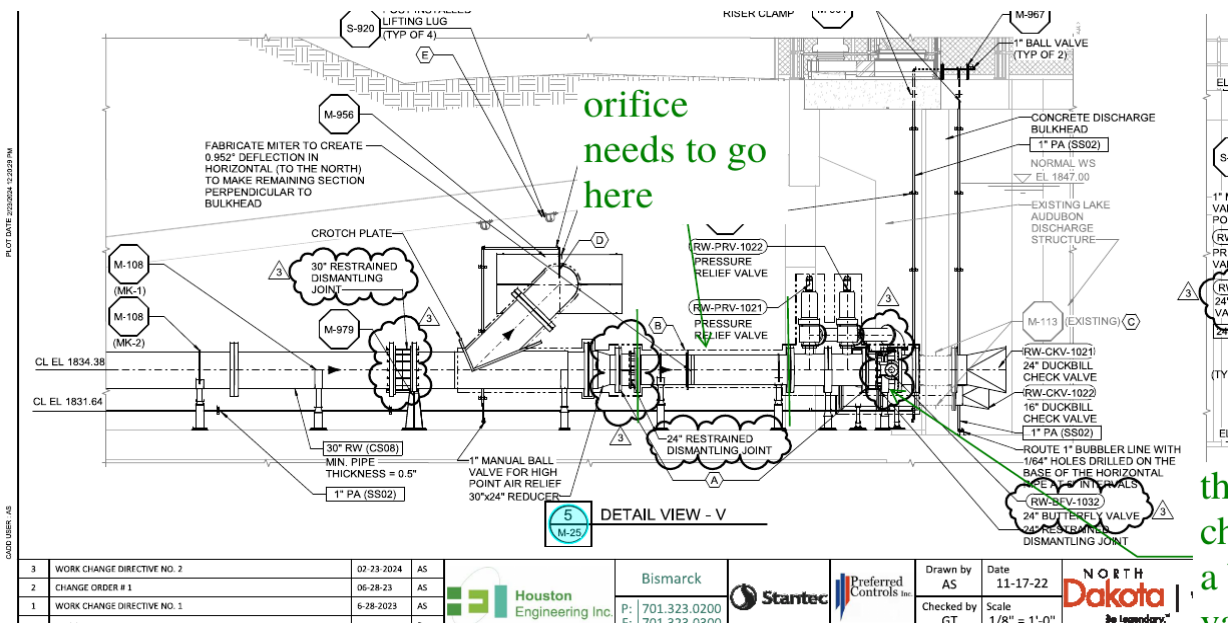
Excerpt from Drawing M-26 (NAWS Contract 6-1A, Houston Engineering, Bismarck), Detail View V — Discharge Pipeline Enlarged Plan and Sections, showing the 30-inch RW header, the 30 × 24-inch reducer, the 24-inch restrained dismantling joint, and the concrete discharge bulkhead. The hand-marked annotation "orifice needs to go here" is the contractor's call-out identifying the installation point for the Anti-Cavitate Orifice Plate. The constrained pipe-length envelope between the dismantling joint and the bulkhead is the geometric driver behind the design selection.
